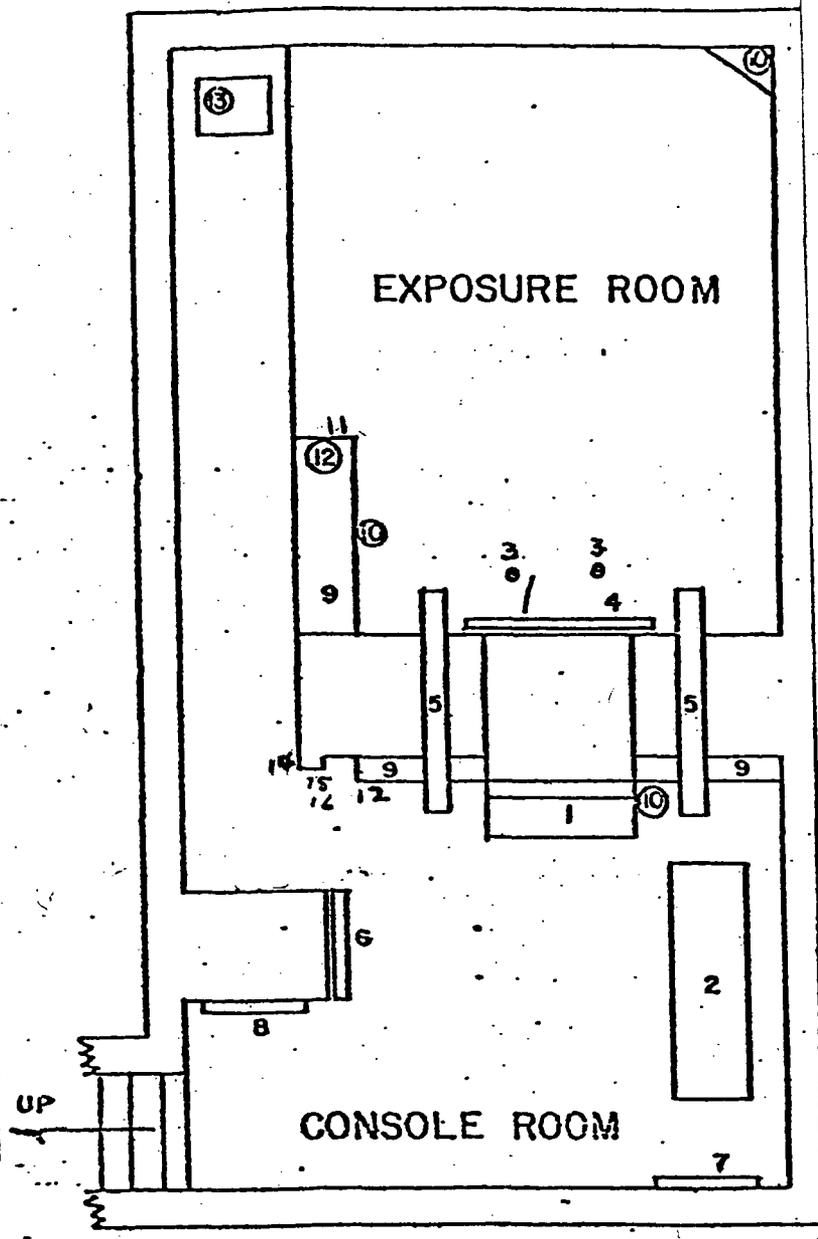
PLAN VIEW UNDERGROUND VAULT
